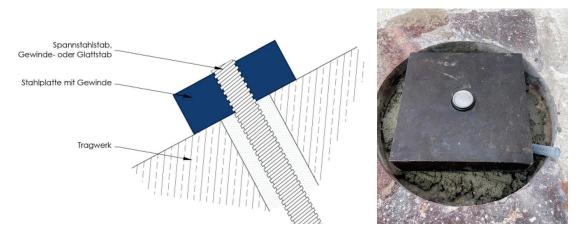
Cross-Section of the threaded ended plates (*left*); example of installation of the plate in a bridge slab (*right*)
